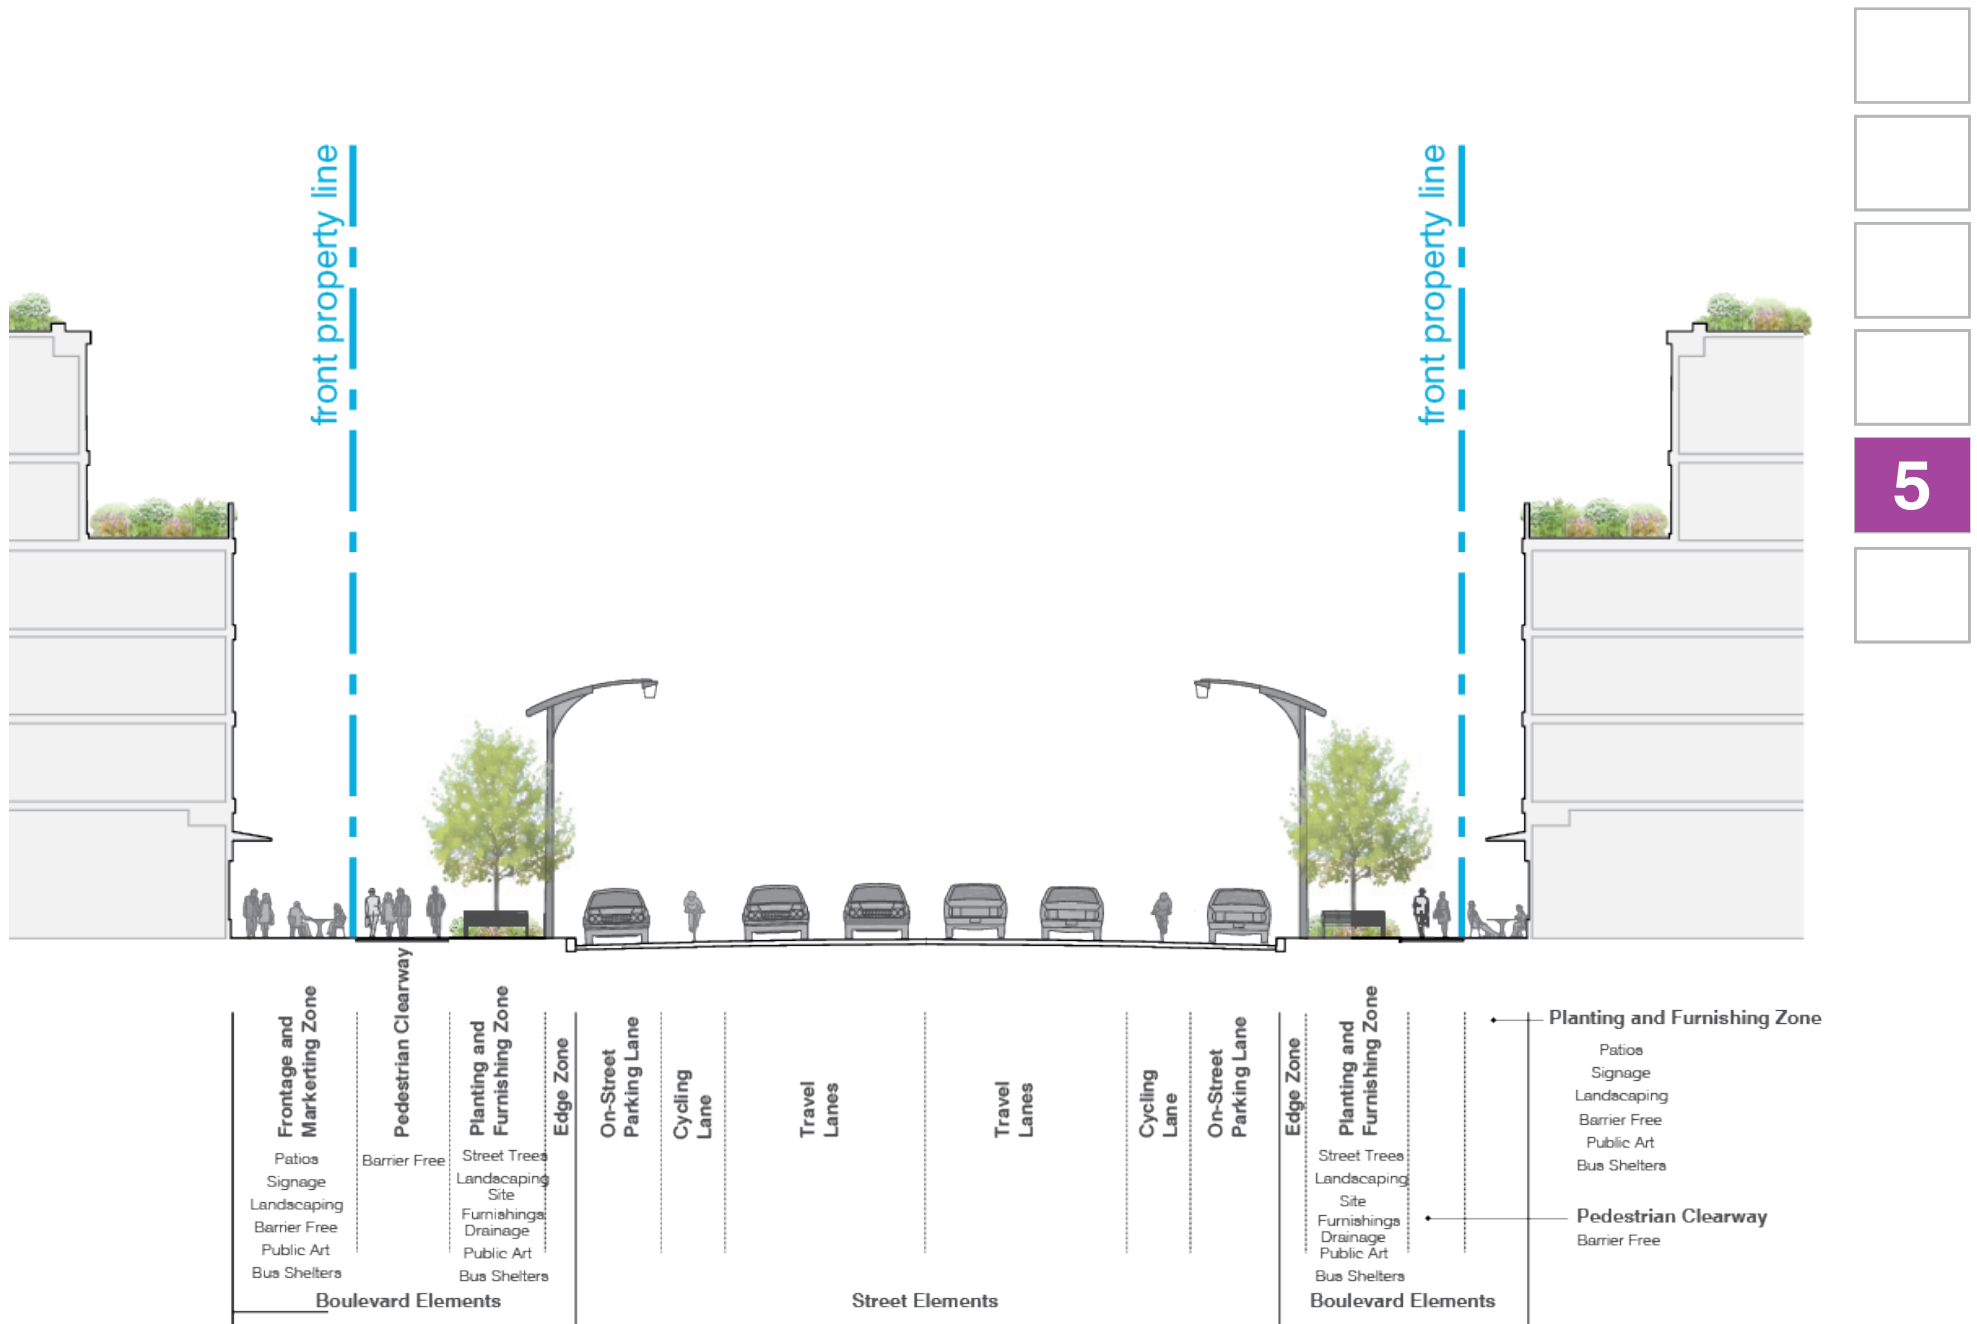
Example of typical street and boulevard elements within general right-of-way.
